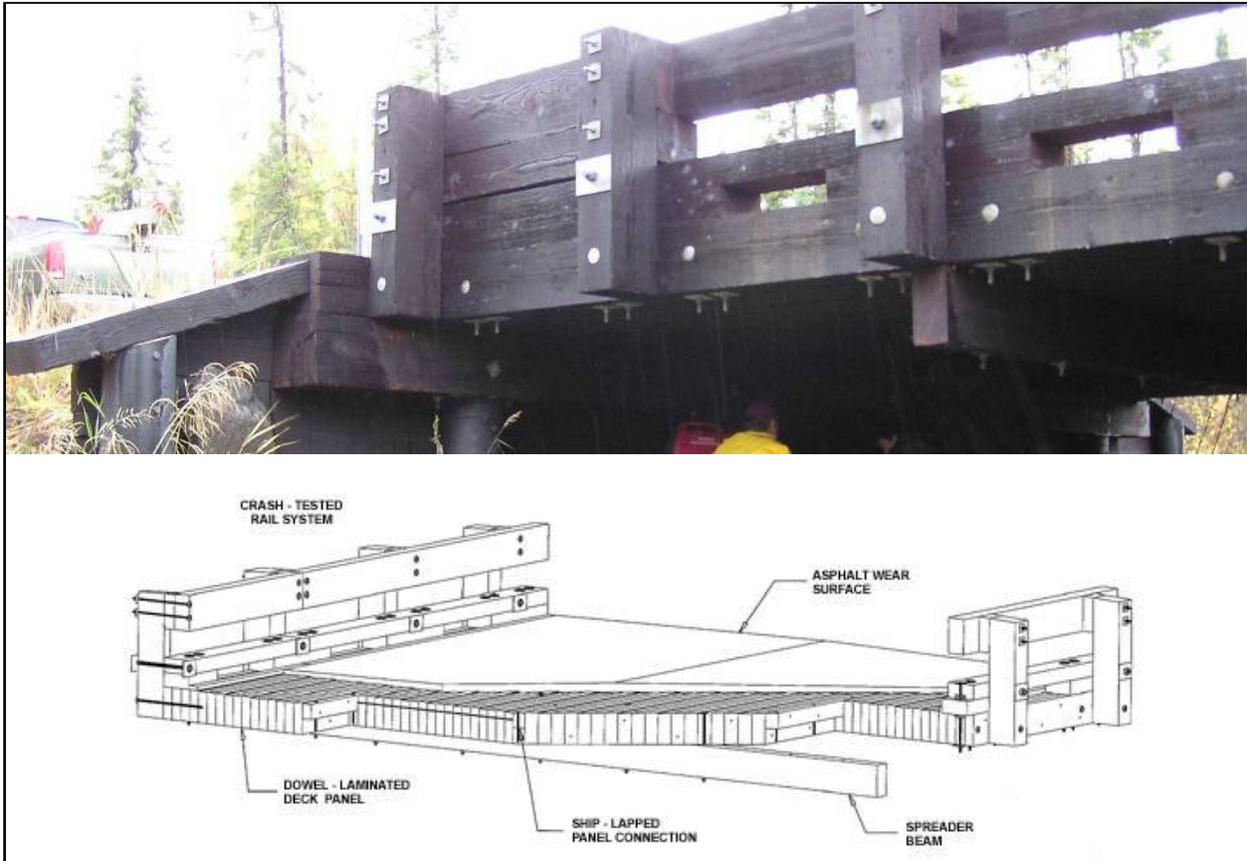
Photograph and associated cross-section schematic of a representative dowel laminated timber bridge that was tested during this project.
